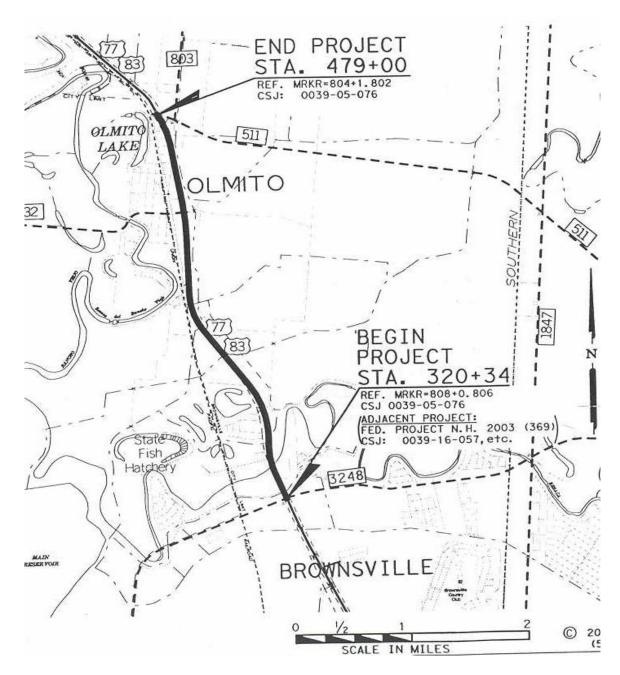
Topographic location of project site and U.S. 77/83 Expressway.
